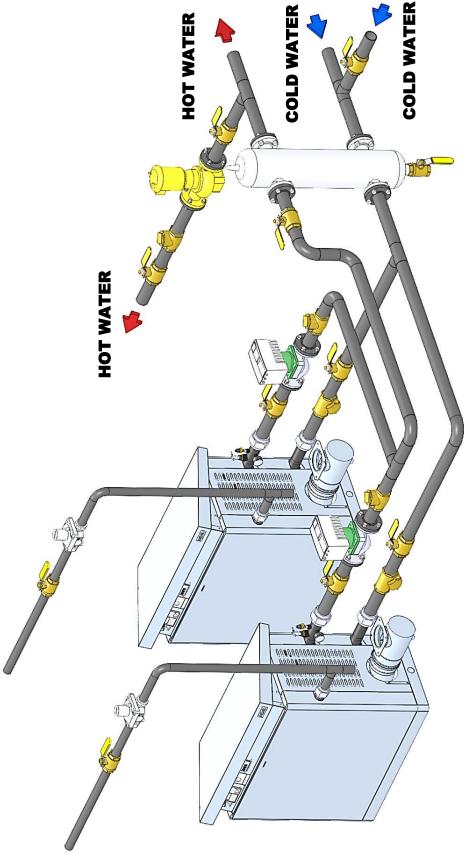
Modulex EXT Multiple Boiler Installation with Hydraulic Separator and DHW Installed
